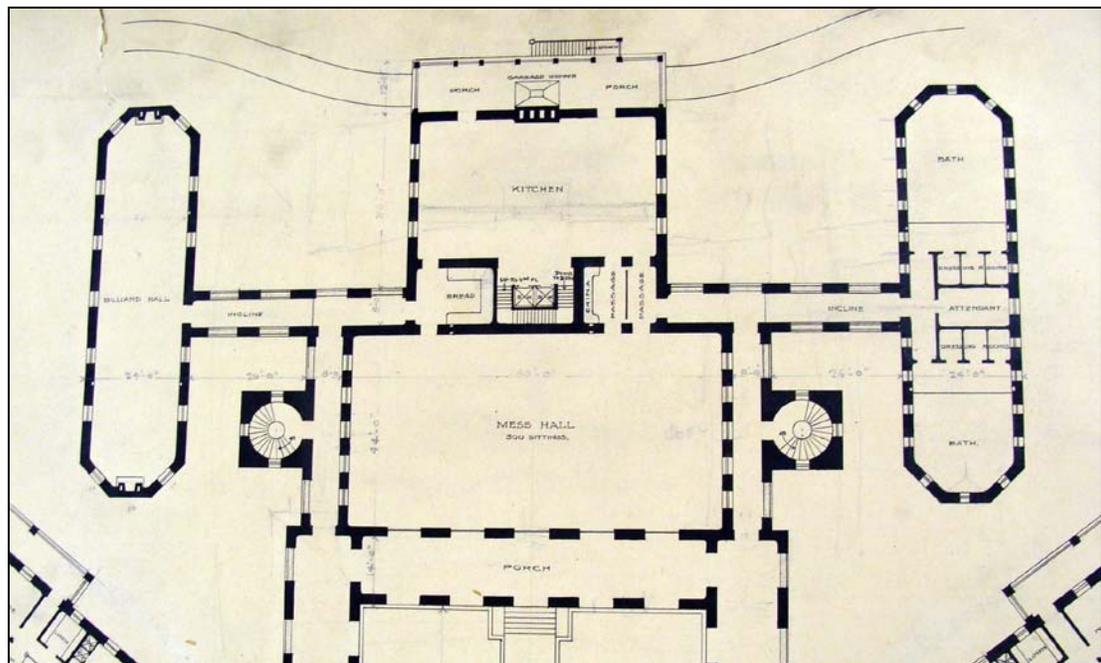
Excerpt of "Proposed Battle Mountain Sanitarium First Floor Plan" showing Mess Hall/Service Building, c. 1902
